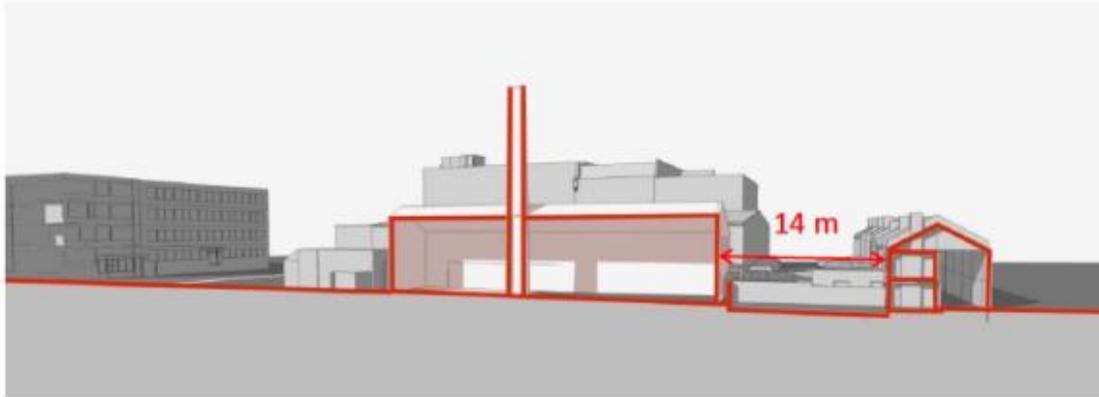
Render of existing buildings and rear gardens on Collingwood Road
